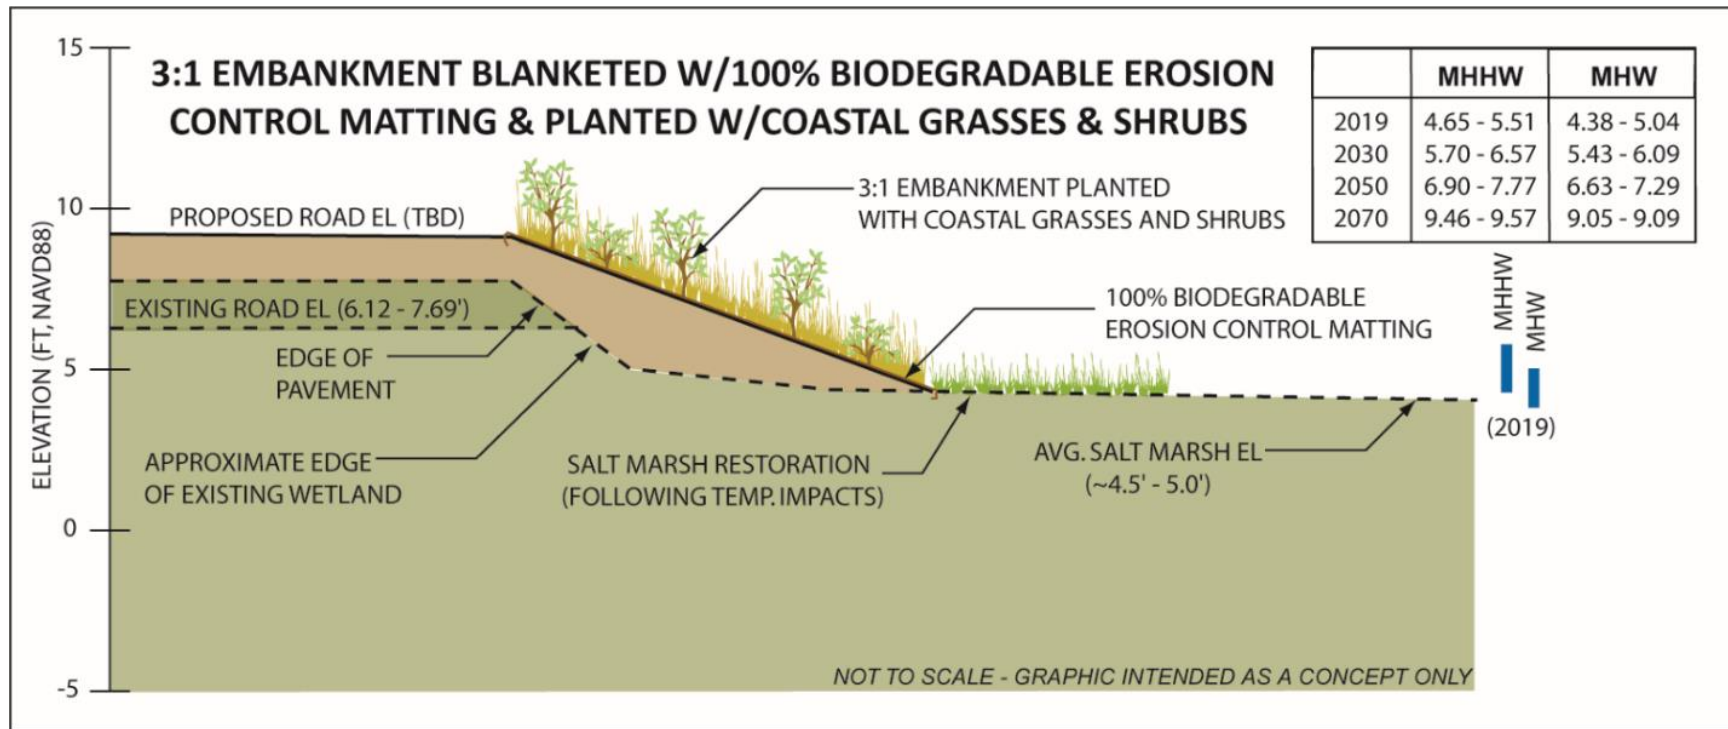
Raised roadway and reconstructed embankment alternative at 3:1 slope.
